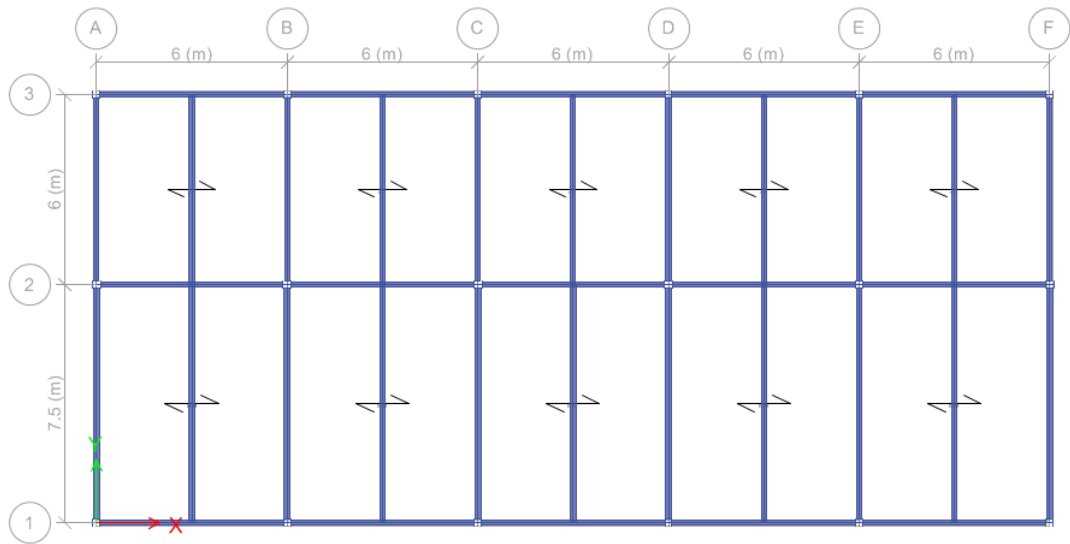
Typical floor plan of the dormitory building (RB-T).
